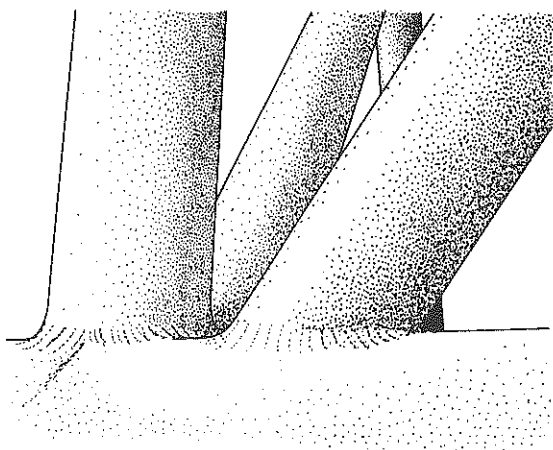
Example of a structure comprising welded cylinders
